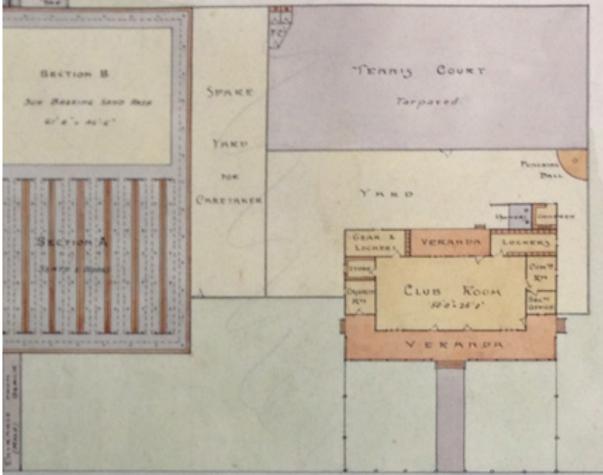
The extract of a 1918 plan for additions to the Surf Sheds shows the adjacent surf club and yard and the room functions, Charles W St Julien, Architect and Engineer. Source: WLS Eng Plan 0003908-01, coloured version hanging plan 980
